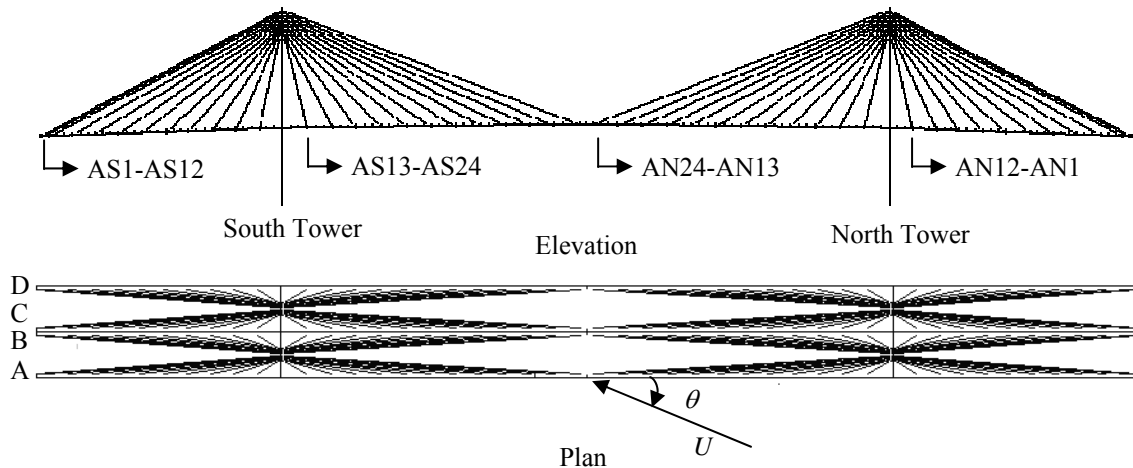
Elevation and plan view of the Fred Hartman Bridge showing stay lines A-D
